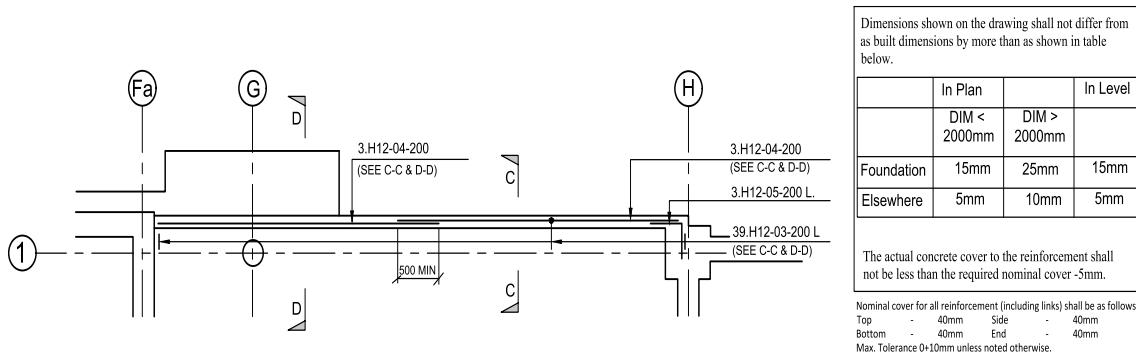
Tolerances displayed on drawings for retaining wall
